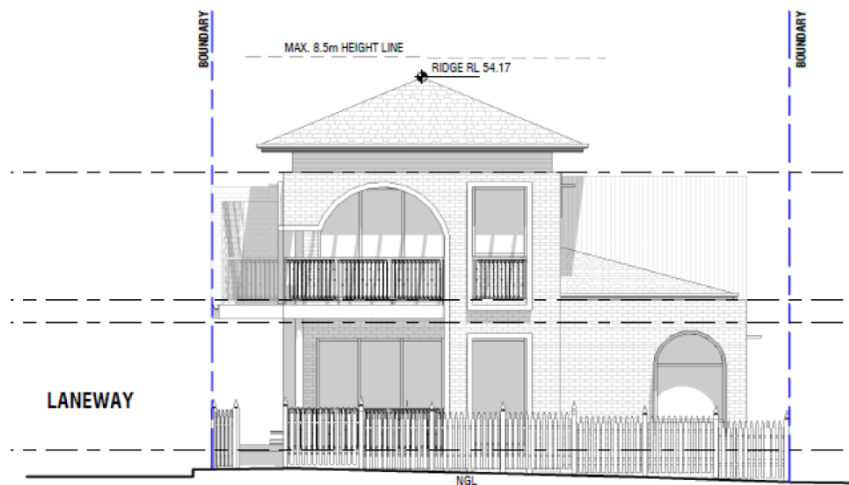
Proposed Clissold Street Elevation. (Source: Kink Architects)
